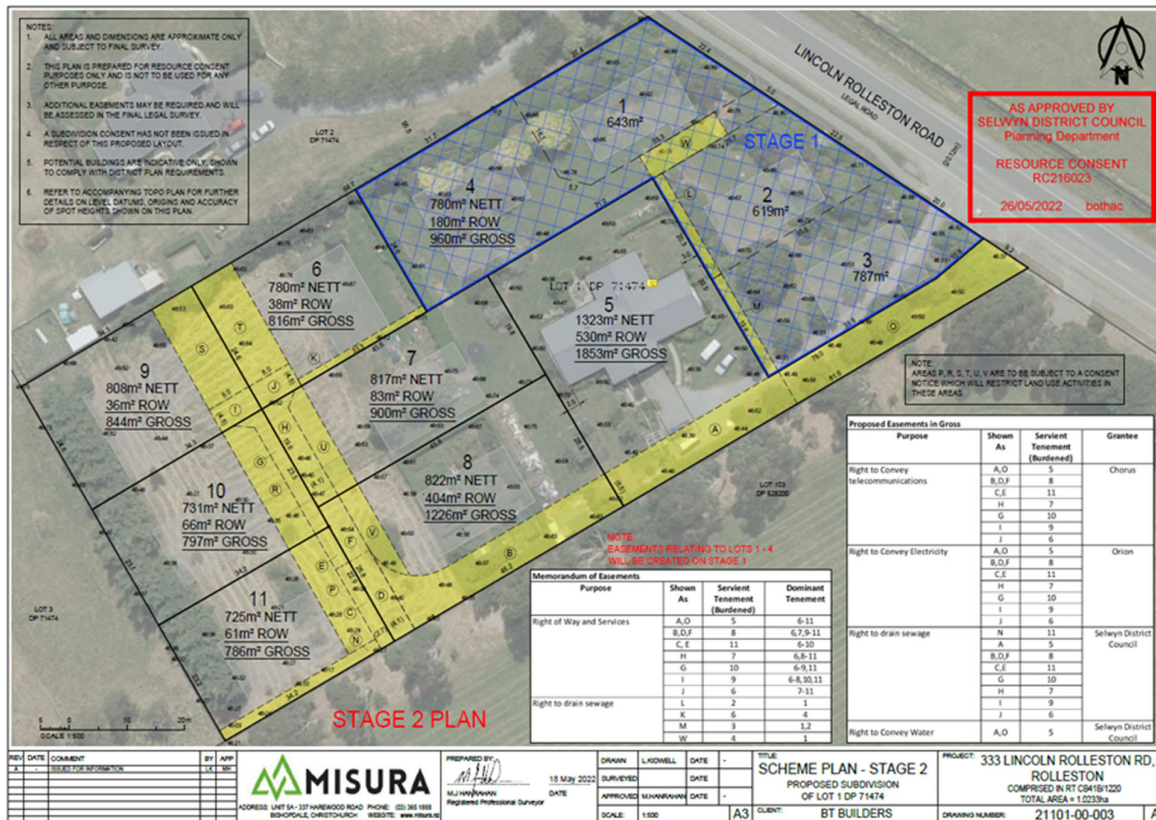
333 Lincoln Rolleston Road Subdivision Plan
